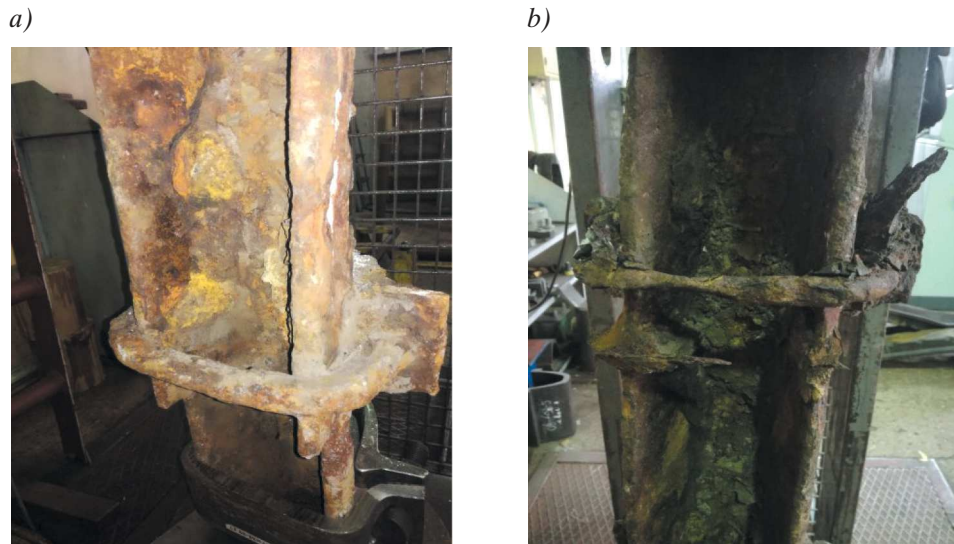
Bow bolts in joints during testing: a) no. 1; b) no. 2
